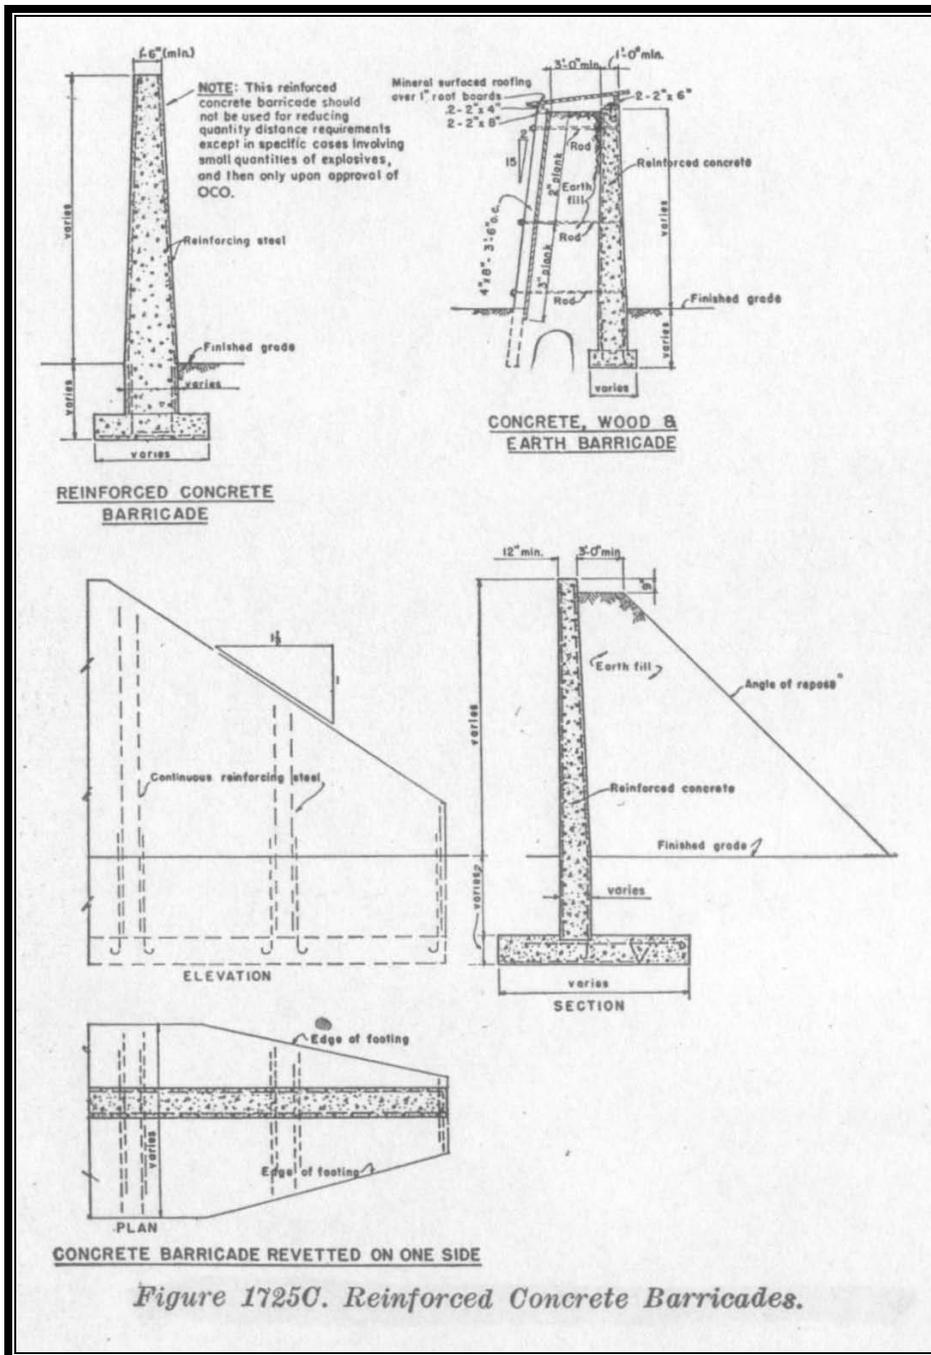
Plans of various concrete barricades (Ordnance Corps 1951:17-31)
